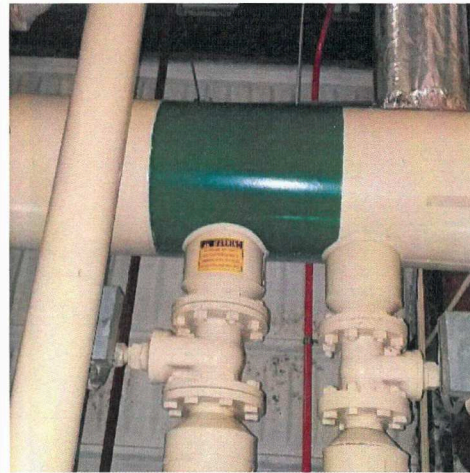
Level 23, Plant Room, Pump 2, Hot Water Piping - Gasket
